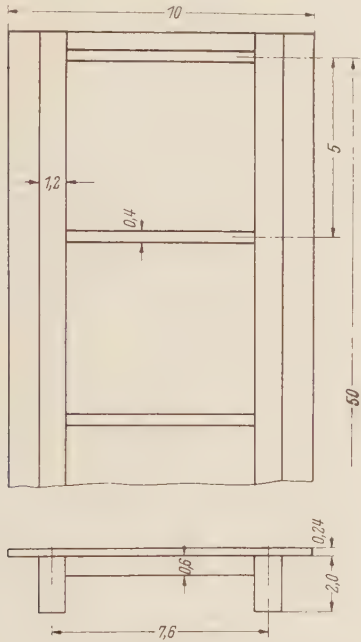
Dimension of Model Ladder Type Beam Bridge G_7 (unit: cm).
